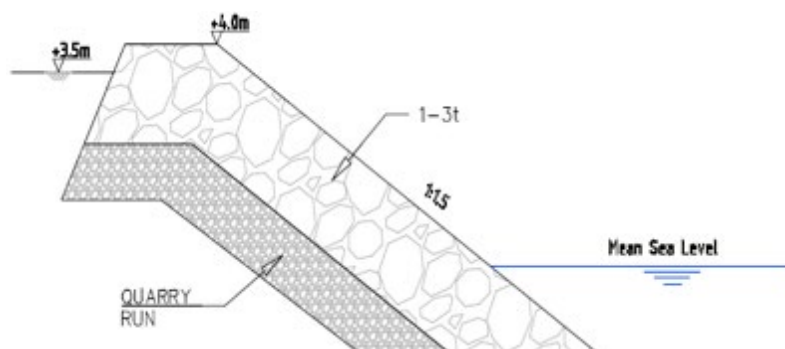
Principle cross section RoRo area revetment (geotextile between quarry run and armor rock).
